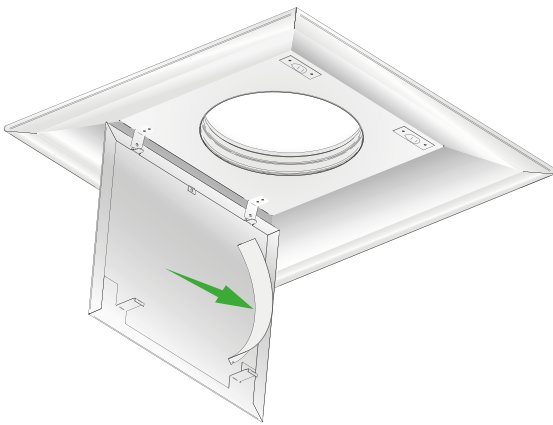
Alternative 1, blanking plate installed in the diffuser face.
